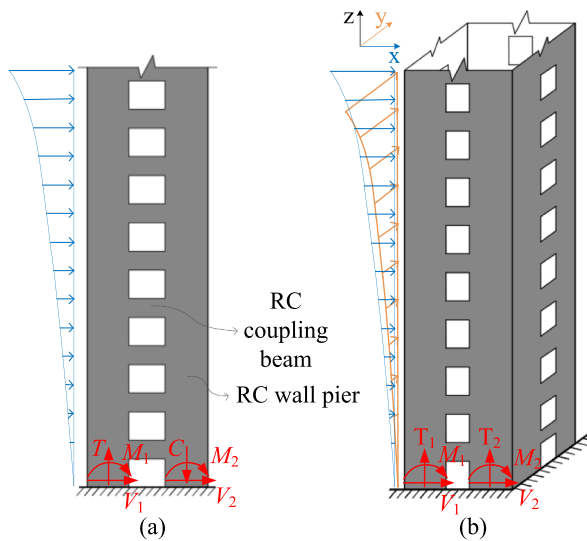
Shear walls subjected to tension-shear-bending: (a) coupled shear wall under seismic loads; (b) wall core under bidirectional seismic loads.
